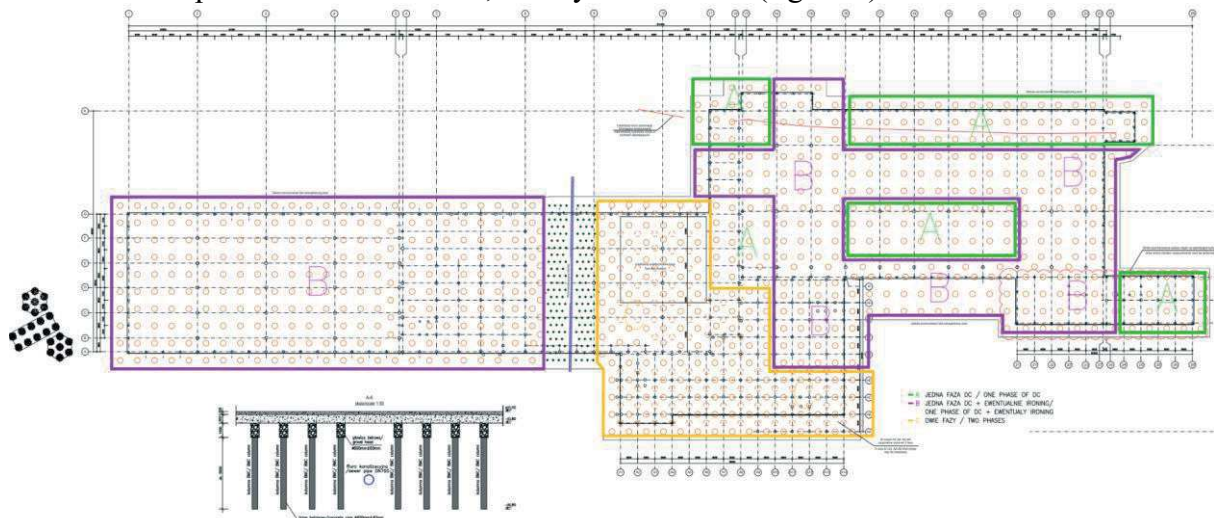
Plan of soil improvement on Havirov – Procedurepak.
